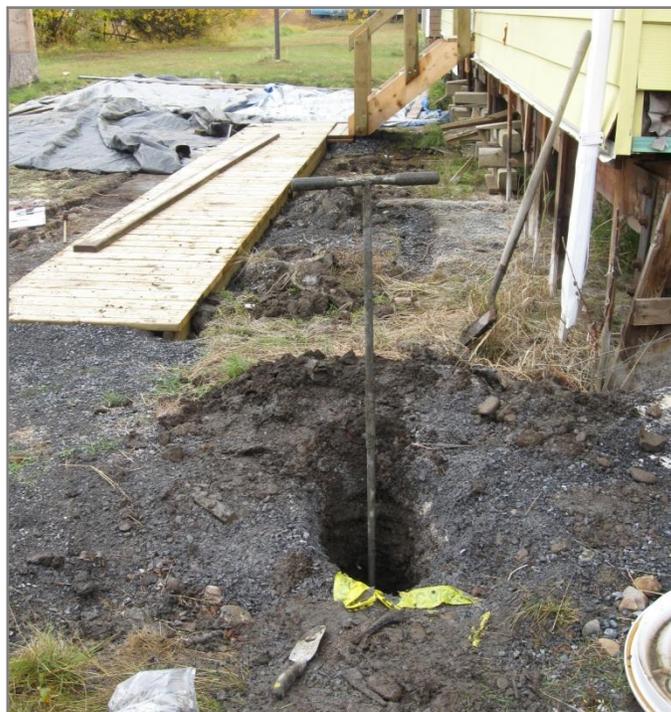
Building materials stockpiled beneath southeast corner of house. ↑
